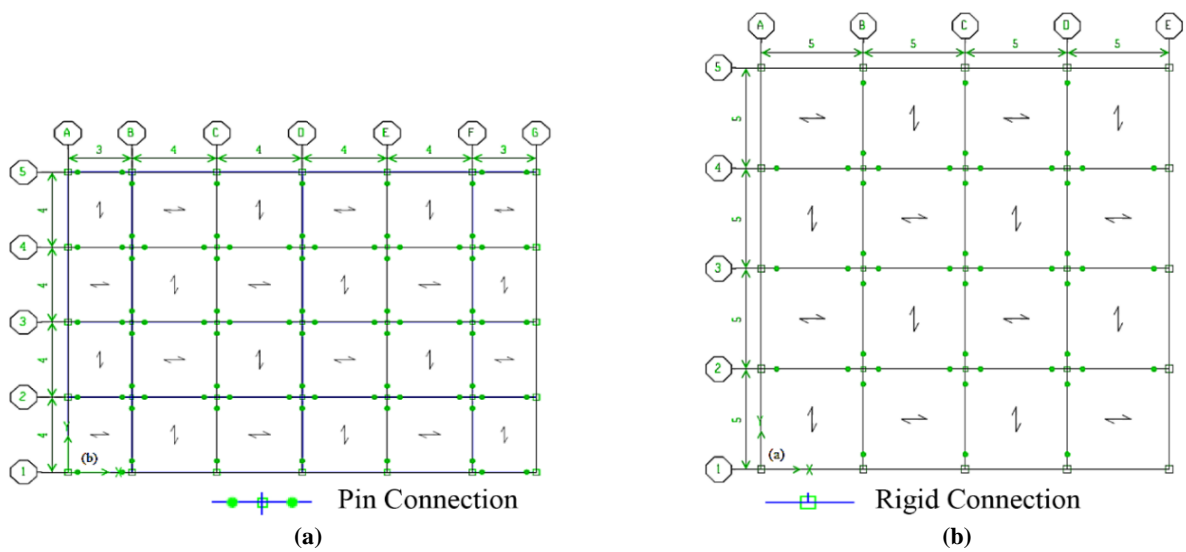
Plans of Modeled Structures: (a) 4-Story Building Plan (b) Plans for 5 and 7-Story Buildings
